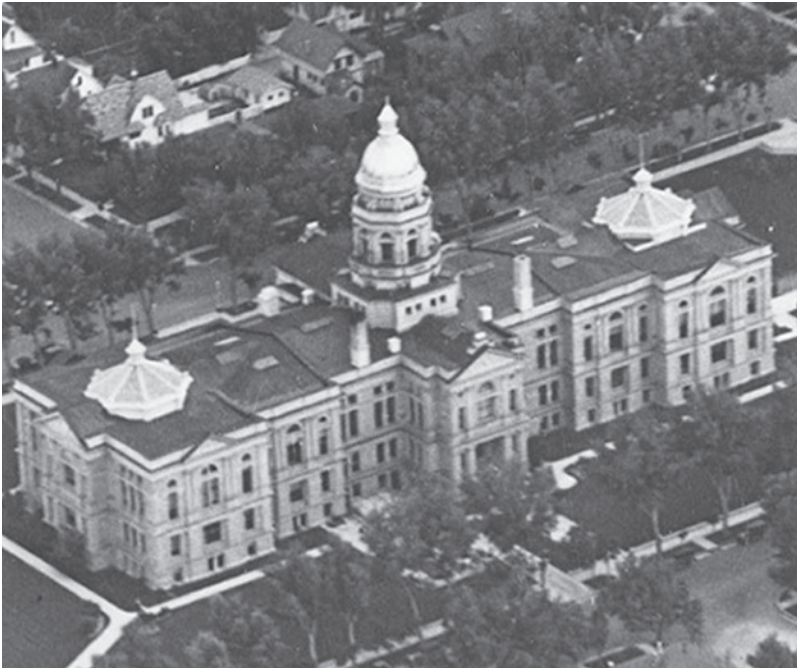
Aerial View from the North, of Historic Roofing, 1930.
